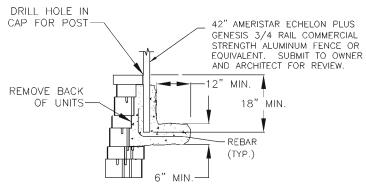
DETAIL-PLAN VIEW MOSAIC-TYPICAL HANDRAIL AND/OR FENCE POST
